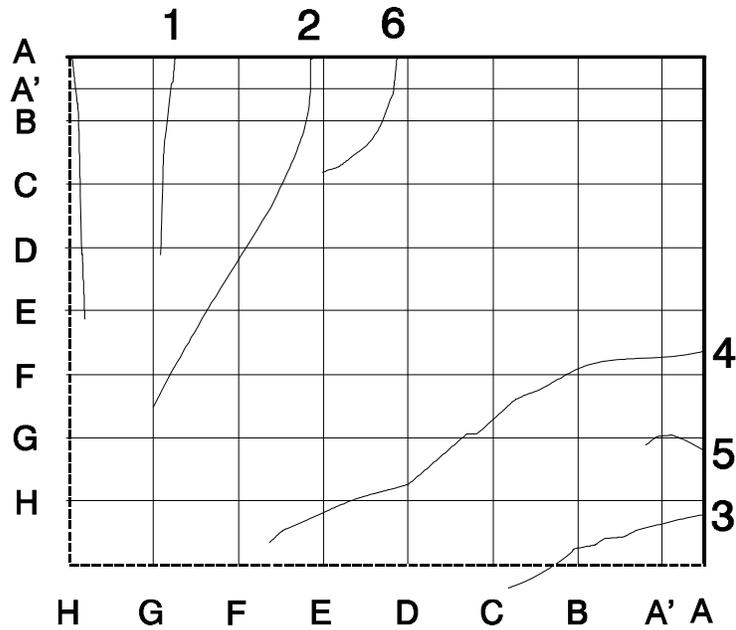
POJ-RC-100 cracking pattern on south face of joint at dead load
